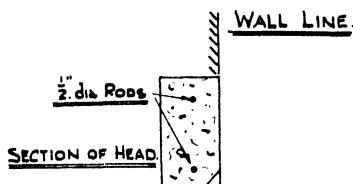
SECTION OF CONCRETE WINDOW HEAD SHOWN IN POSITION
